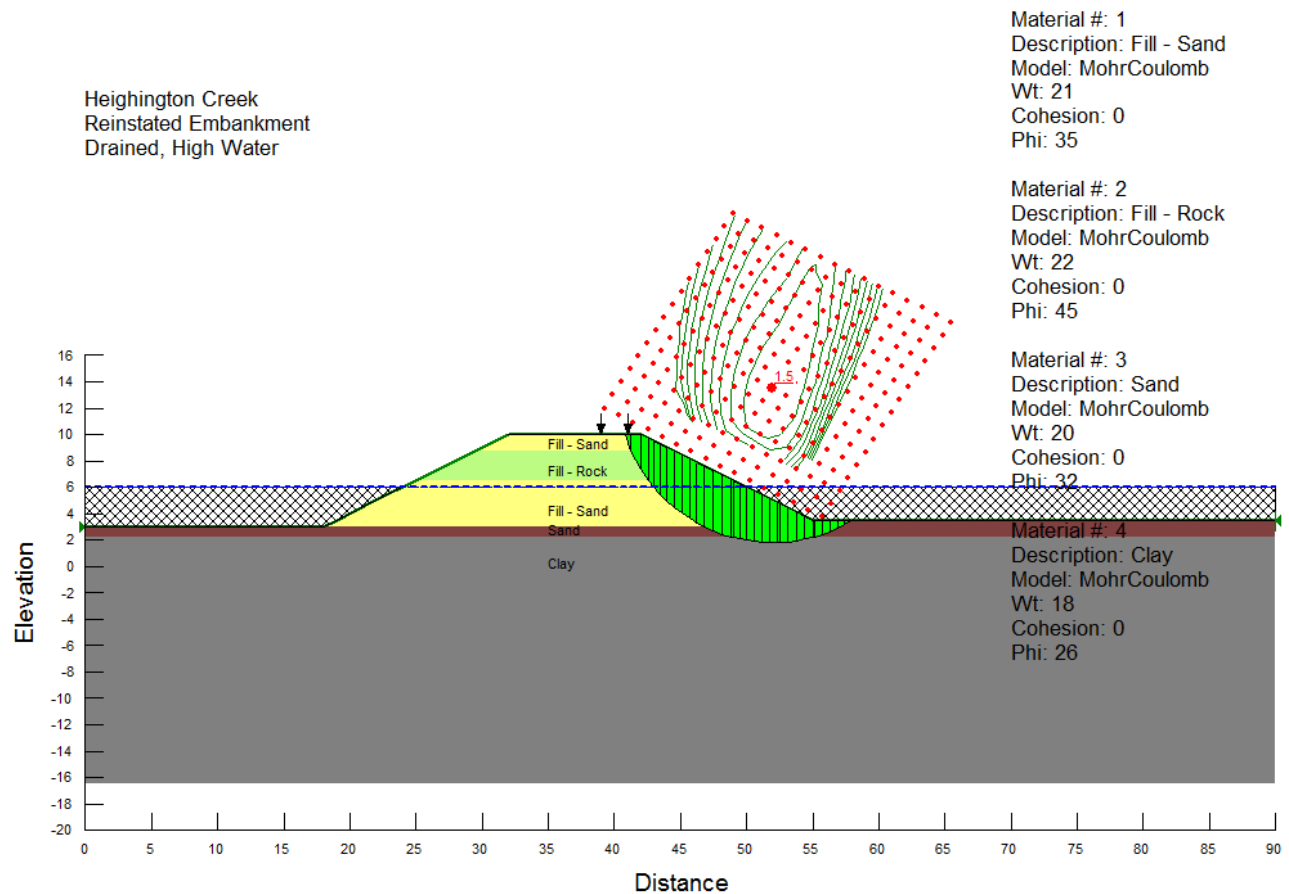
Slope stability analysis after culvert replacement right side reinstated embankment with 2H:1V granular fill foreslopes under drained condition
